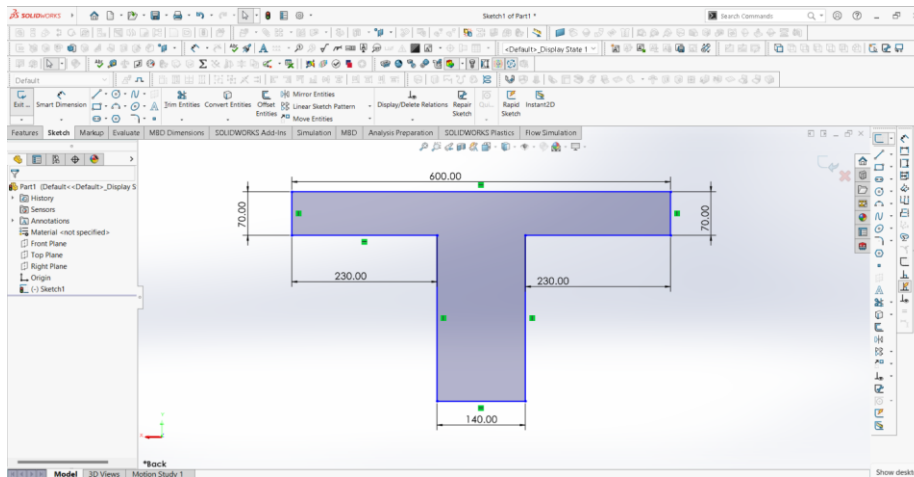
2D sketch exiting model of T beam with exiting model in solid work 2021
